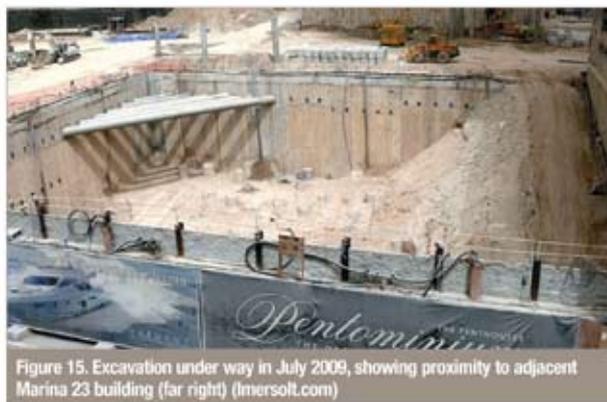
Excavation under way in July 2009, showing proximity to adjacent Marina 23 building (far right) (Imersoft.com)
